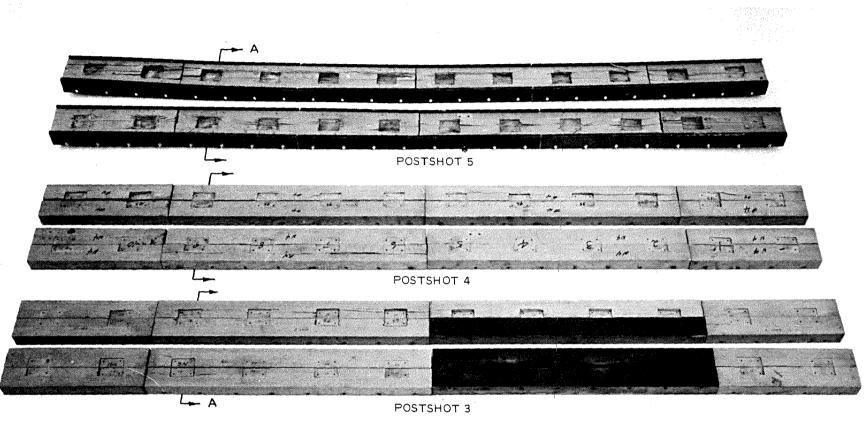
Postshot view of the damaged footings showing the punching damage. Note also the inward bow of the Shot 5 footings.
